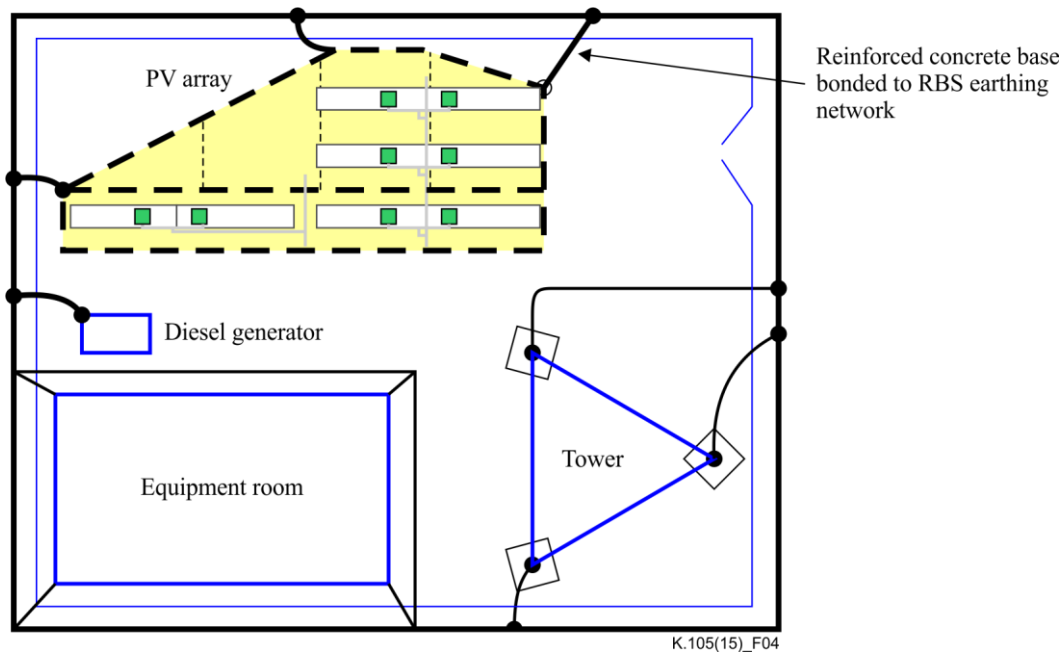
Earthing and bonding when the PV support is installed on the ground
